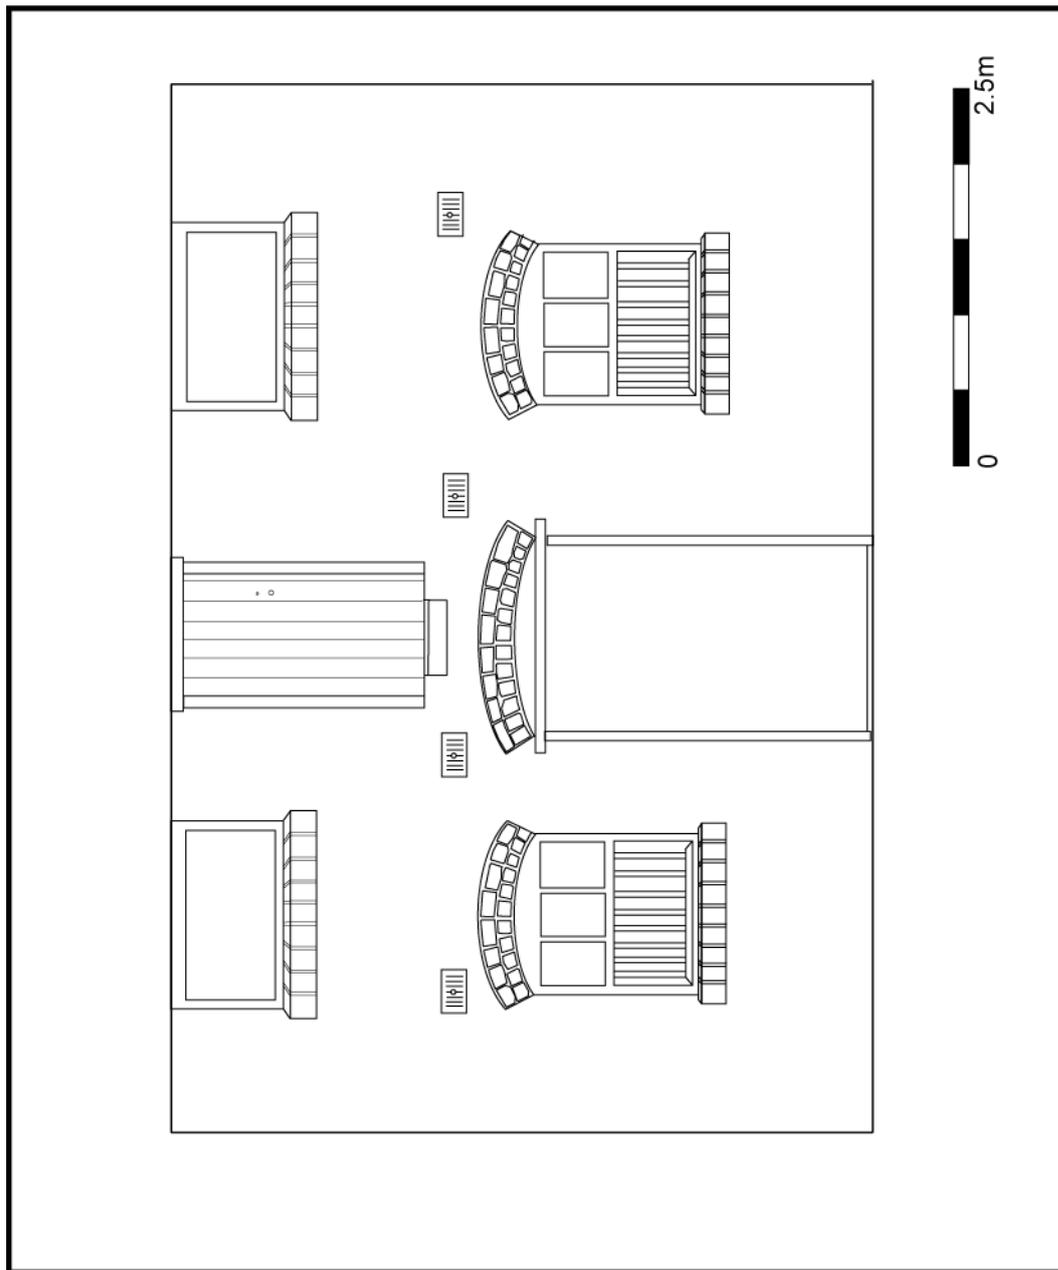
Principal E-facing elevation of Building 4 (Stable, Loft and Dovecote)
